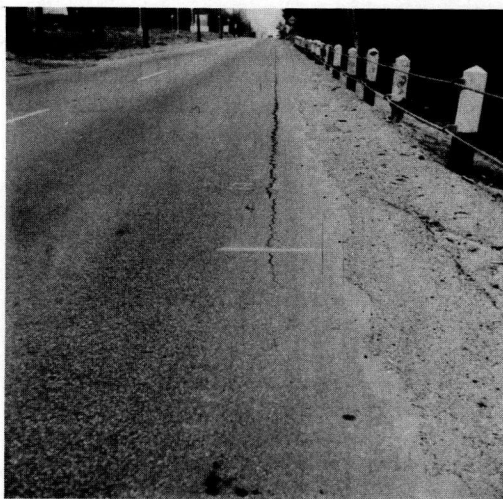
Longitudinal crack narrows down and stops at reinforced section (bottom), Walpole.
